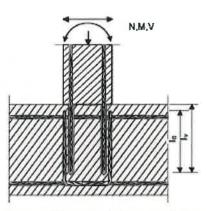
Overlap joint at a foundation of a column or wall where the rebar is stressed in tension
